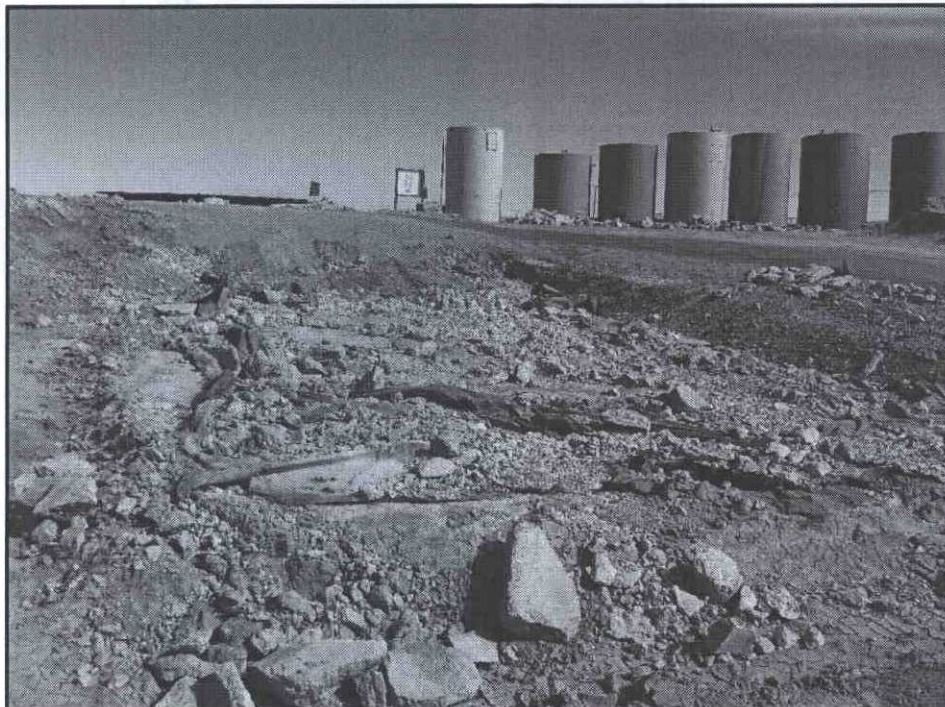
View, looking north of the concrete impoundment structure during the first concrete sampling
